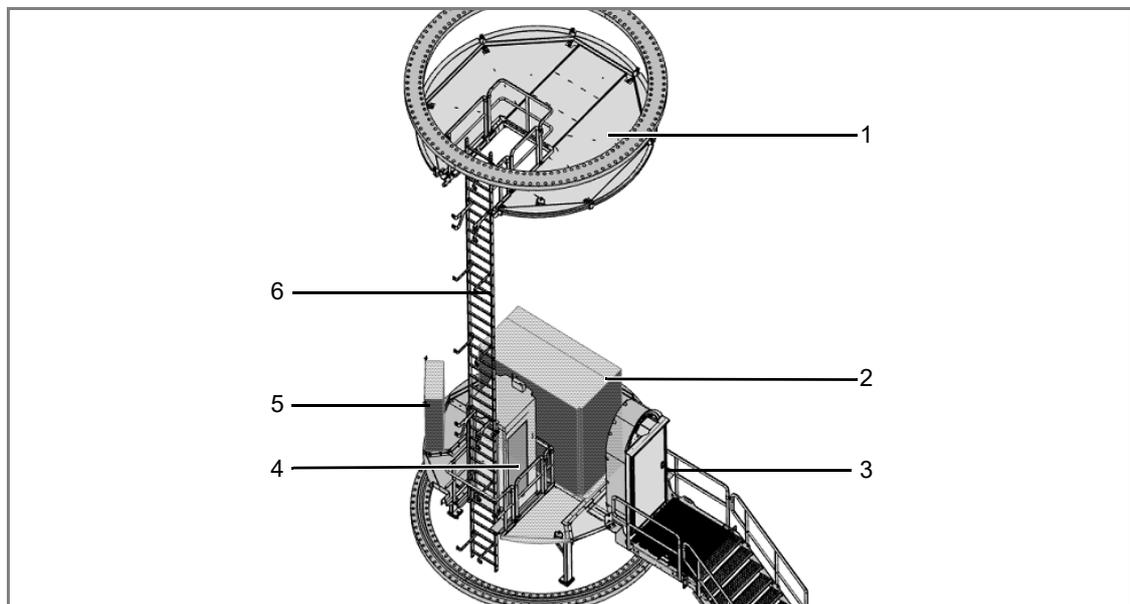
Overview of installations in the bottom section of the steel tube tower with a vertical ladder (in case of a step ladder different image)
